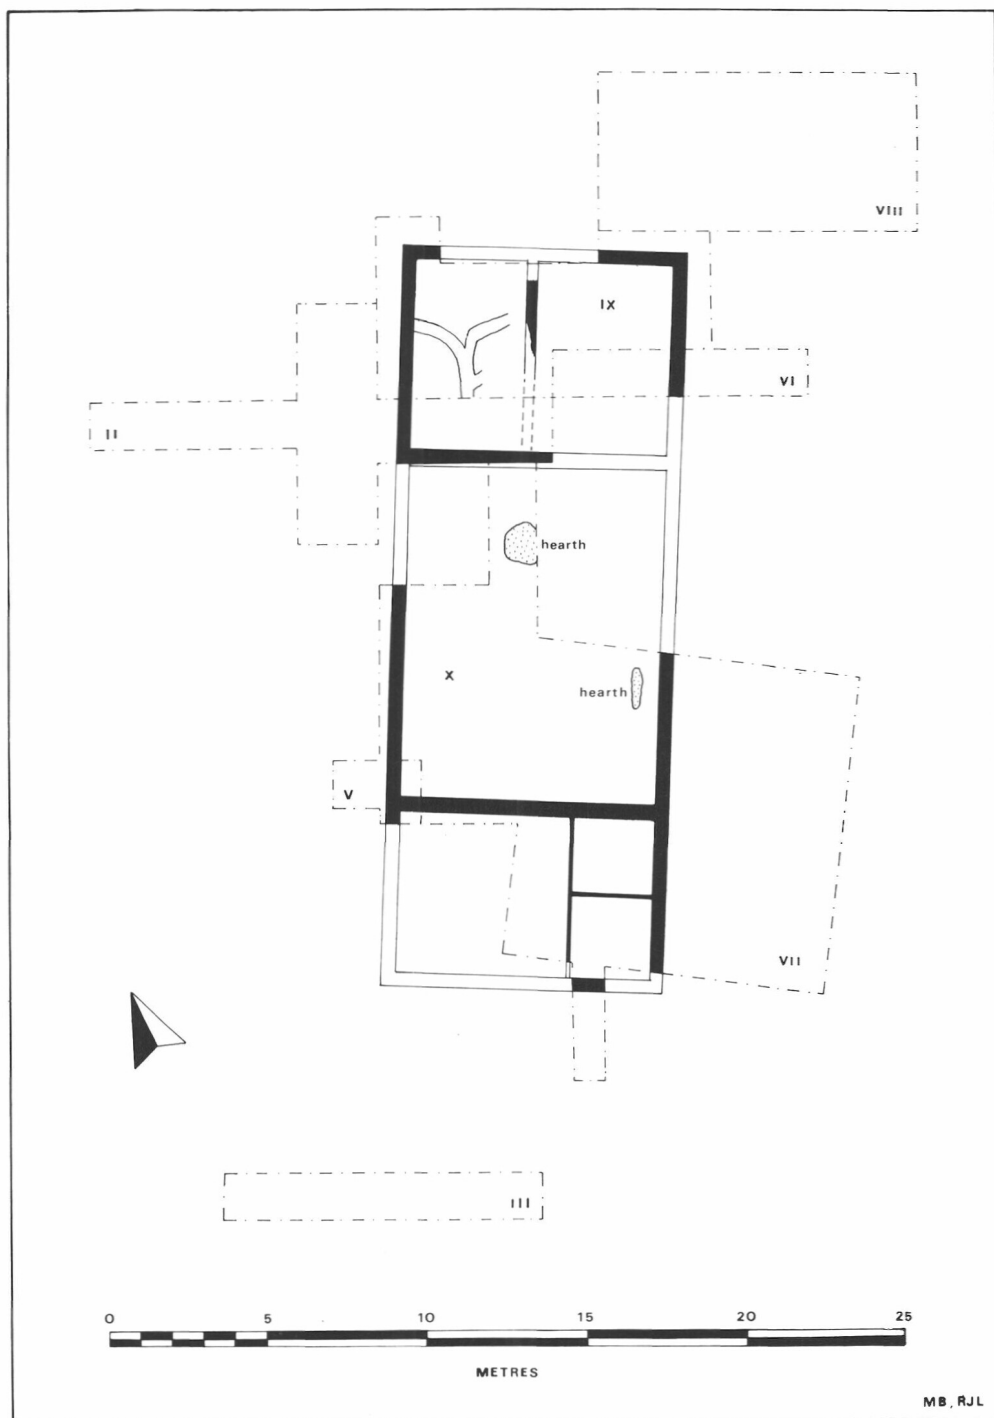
Carsington Site B, 1980: plan of building, reconstructed.
